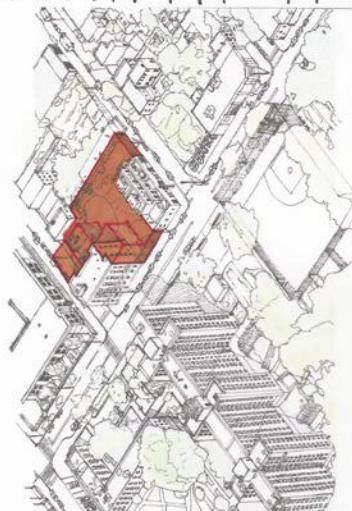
BUILD VOLUME (ELEVATED) & OPEN SPACE CONFIGURATIONS AT SITE 1 (.R-SITE, RICHARDS STREET NORTH)
